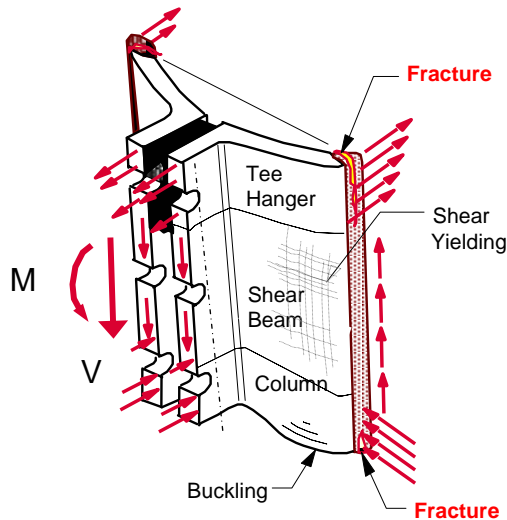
Behavior of Bolted-Welded Double-Angle Connection
